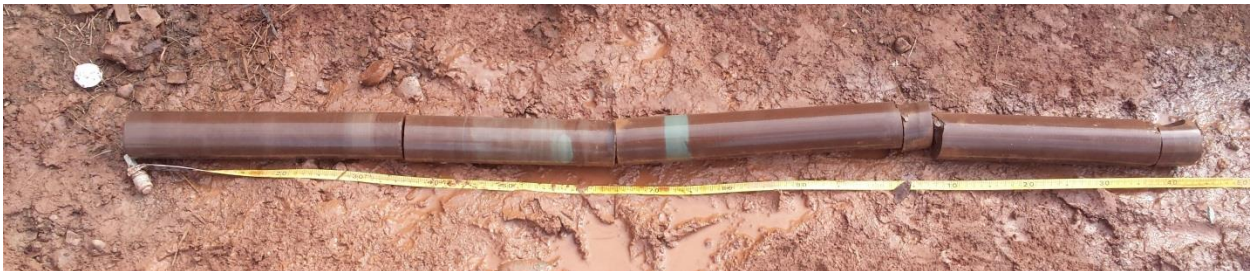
Run 17 from elevation 84.3 to 82.8m.
